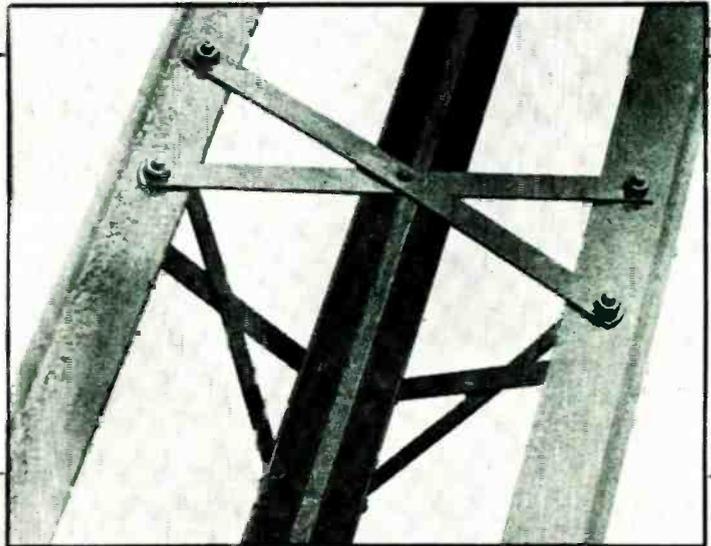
, below. This section carries three saddles to which the guy wires will be fastened
